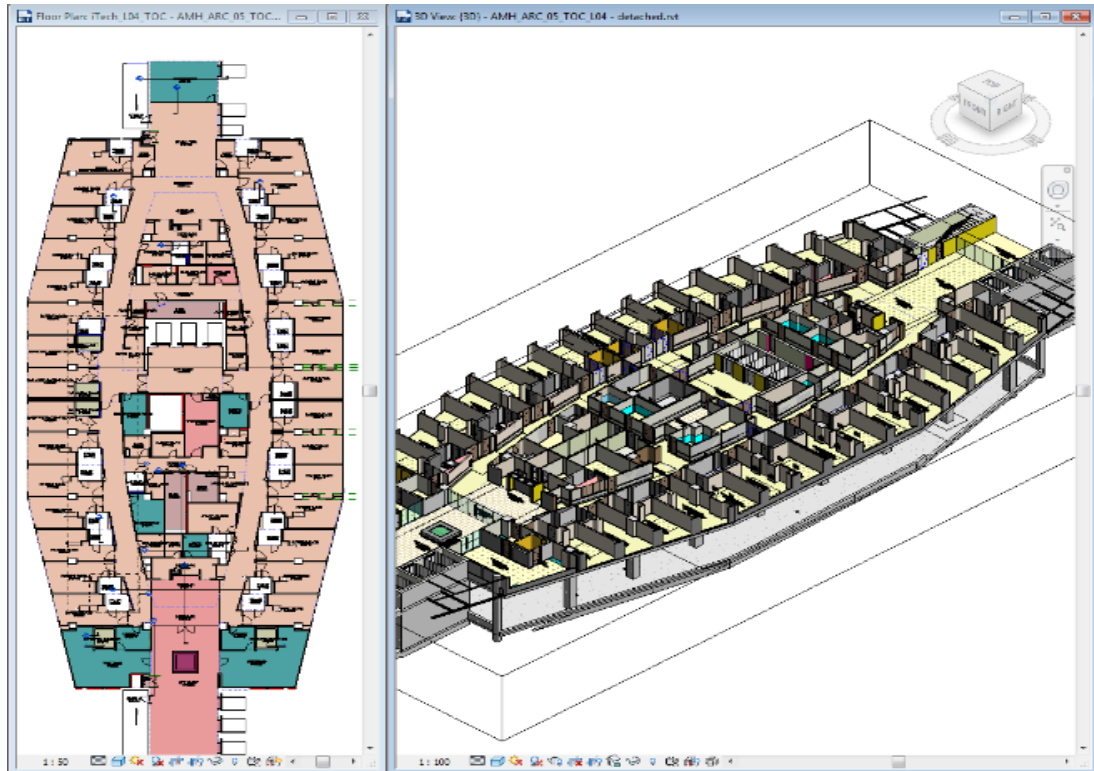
Layout and 3D view of section of fourth floor of Tower C
